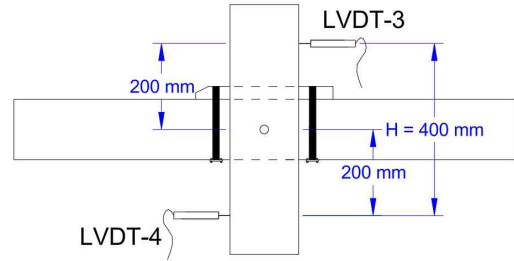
LVDT position on wood joints (LVDT-3: top column and LVDT-4: bottom column). LVDT: linear variable differential transducer.
